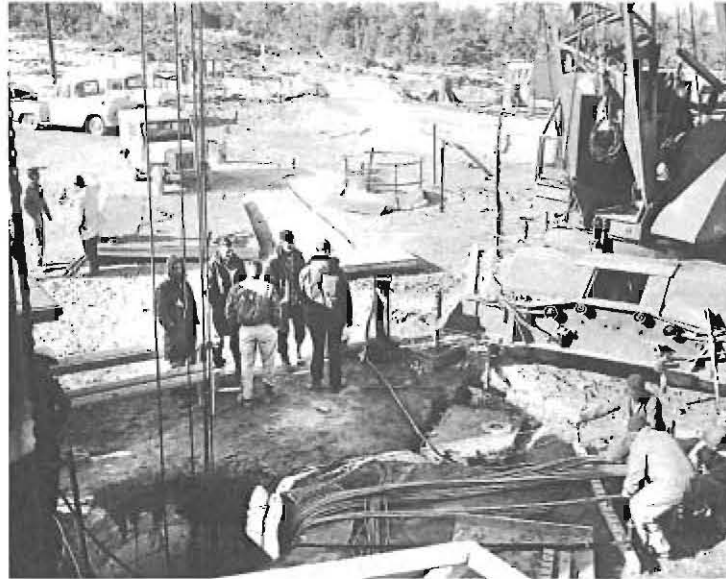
J-6, Assembly Hole 4W, TA-49-Frijoles Mesa
